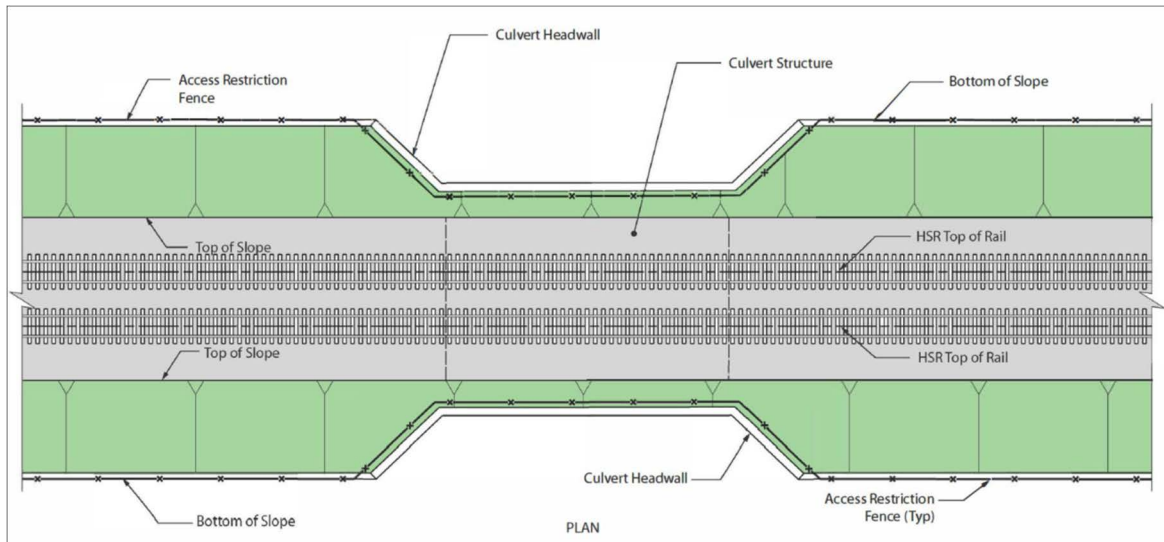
Typical Plan View of Wildlife Crossing Structure
